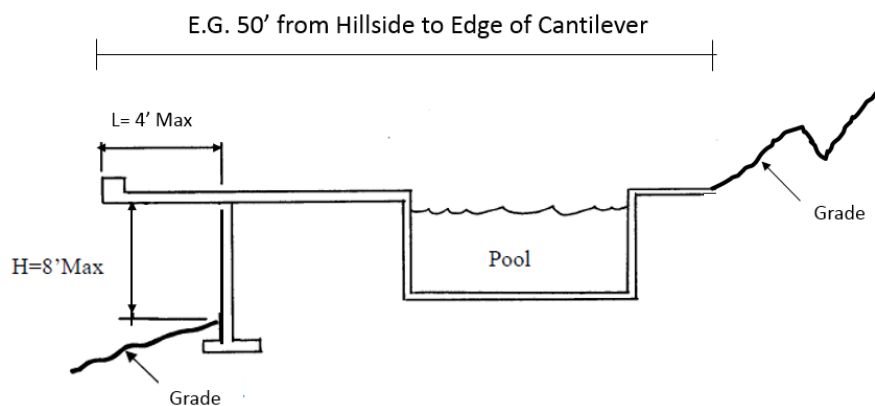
BUILDING HEIGHT WITH A HILLSIDE WASH CROSS SECTION
